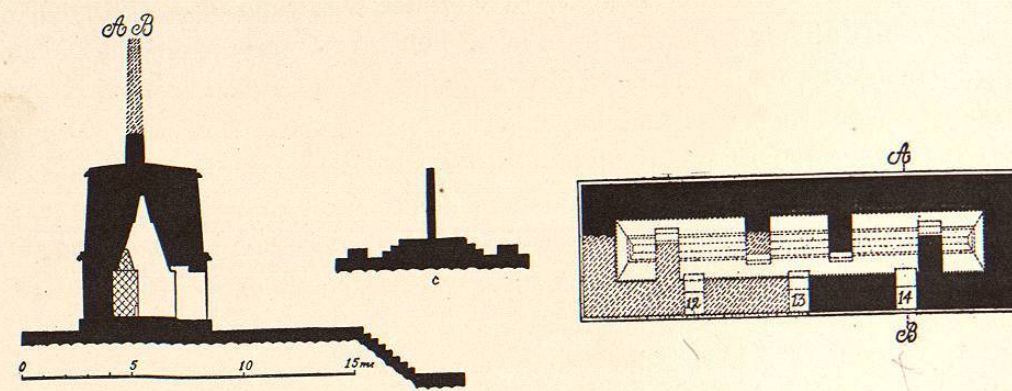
STRUCTURE 20: SECTION AND GROUND-PLAN (RESTORED).
